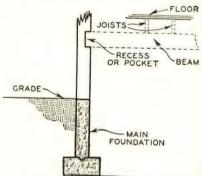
Section of Foundation Wall Where Grade Is Below First Floor
